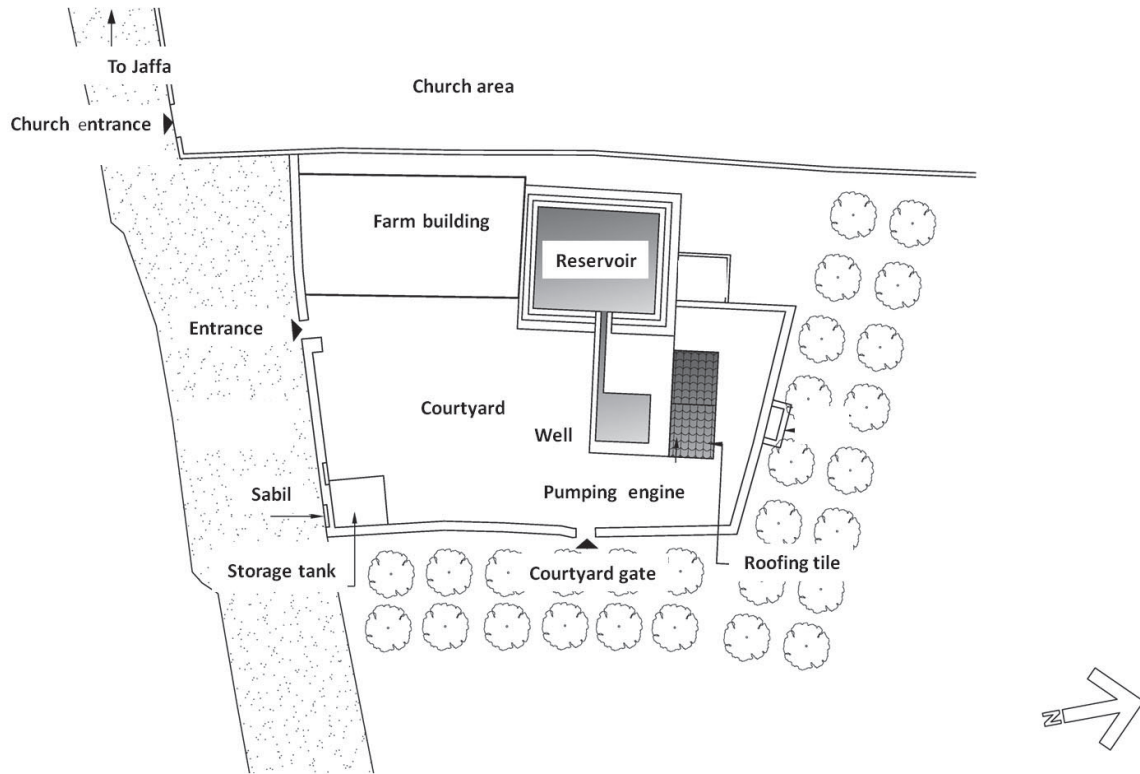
Plan of country house, *khān* of the Russian Church, Abu Kabir (Sasson and Katzir 2013:52).
